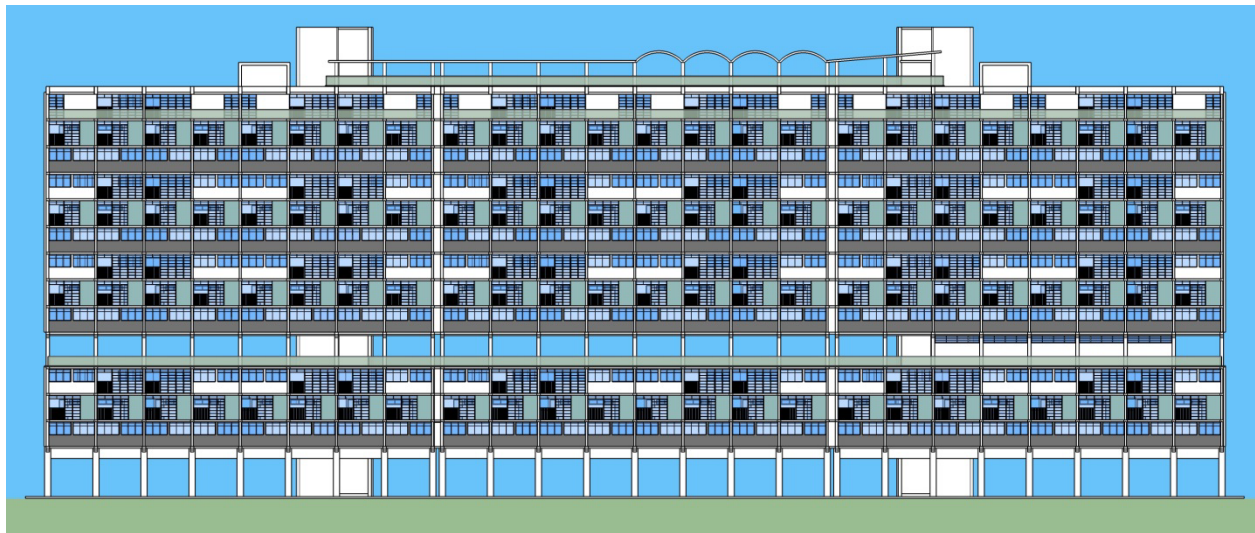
Cerro Grande's east elevation (original 1954 layout)
